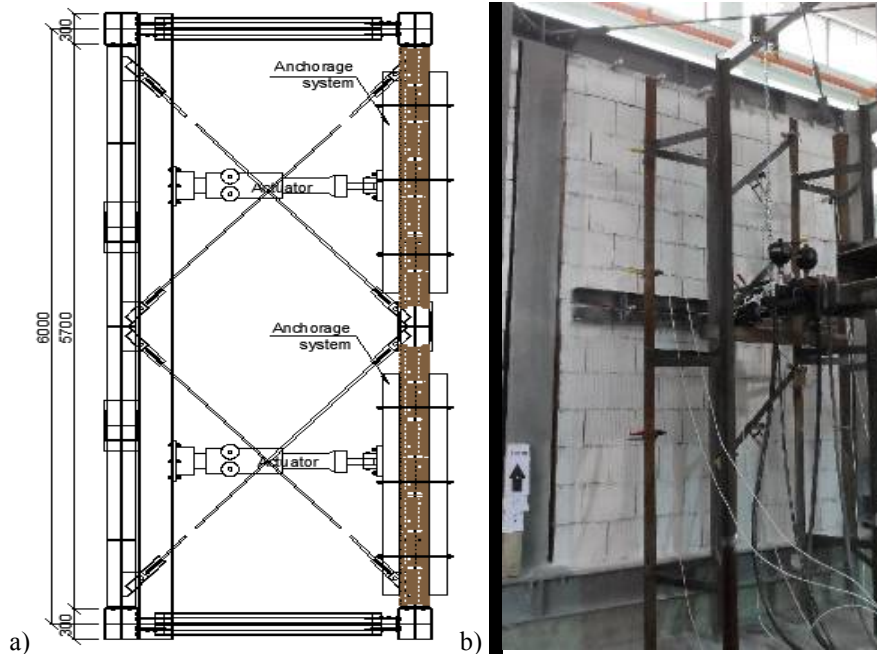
Test setup for masonry infill wall panels: a) Plan view; b) Test specimen
